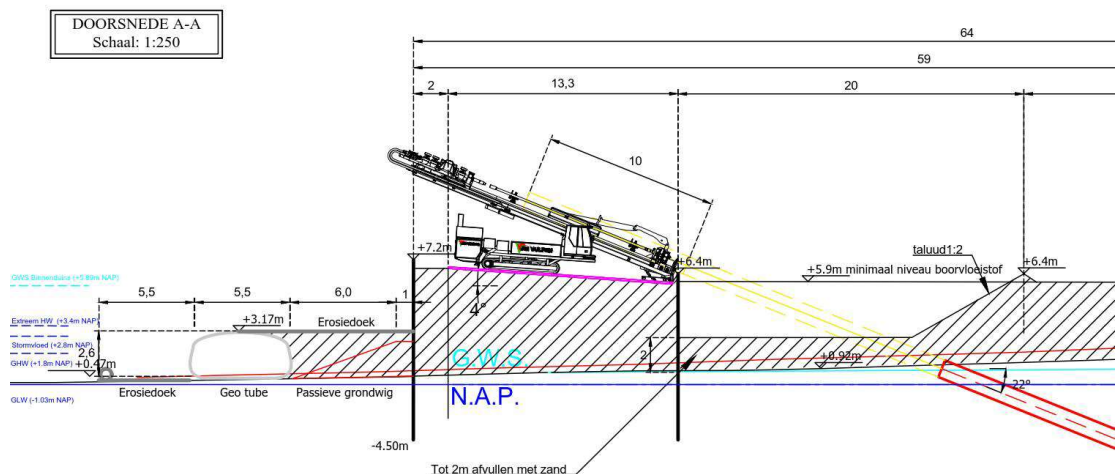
Cross section of the geotube offshore of the sheet pile wall of the drilling pit.
